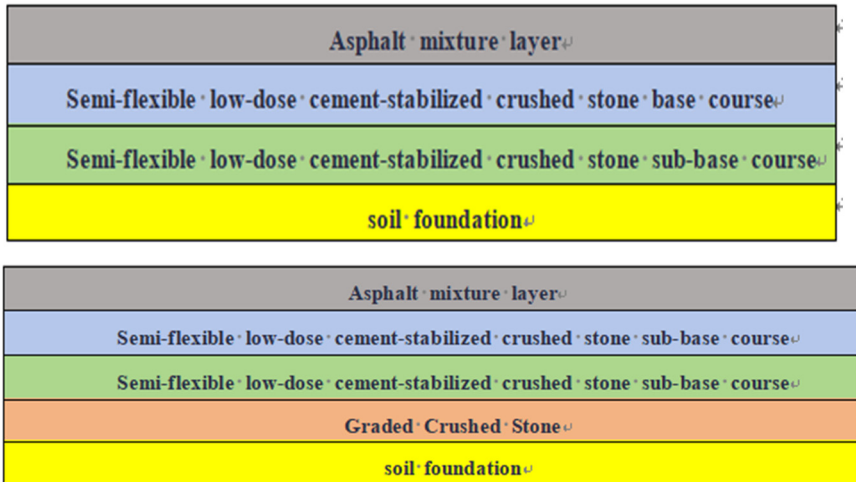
Pavement Structure of Low-grade Highway for Structures 5 and 6
